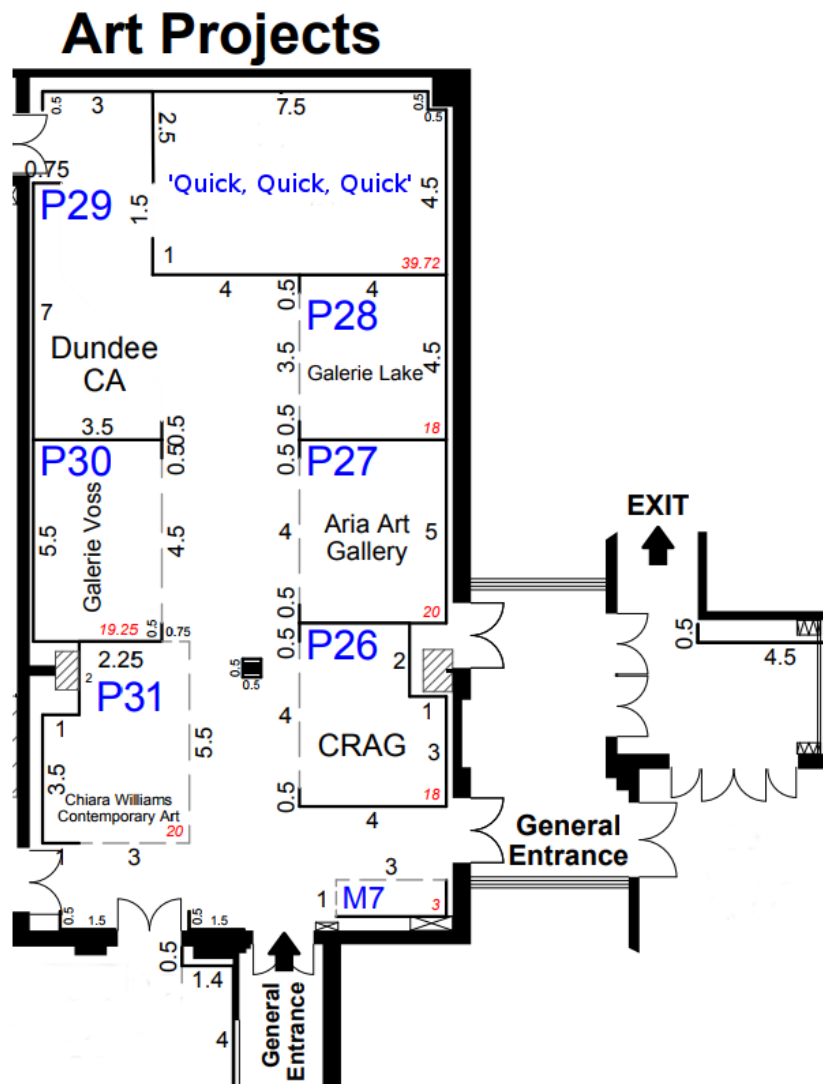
Section of London Art Fair 2018 floorplan showing area containing 'Quick, Quick, Quick'
